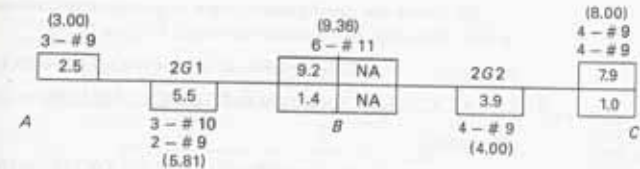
Longitudinal reinforcement areas (sq in.) required and bars selected for girders 2G1 and 2G2.
